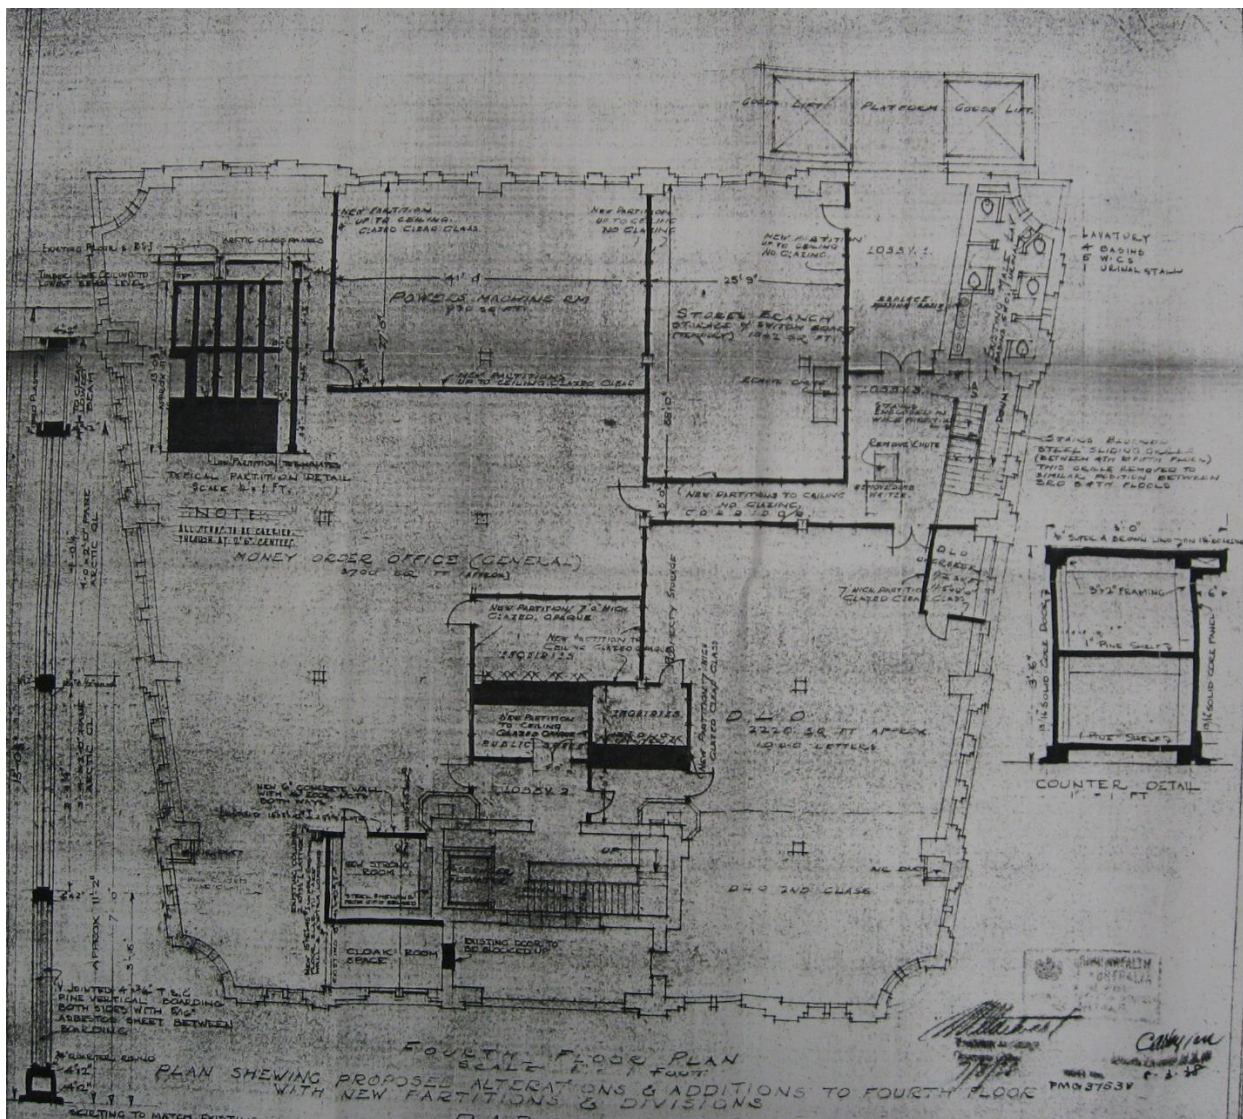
Parcels Post Office Central Railway Station, plan shewing proposed alterations & additions to fourth floor with new partitions & divisions, 1938
